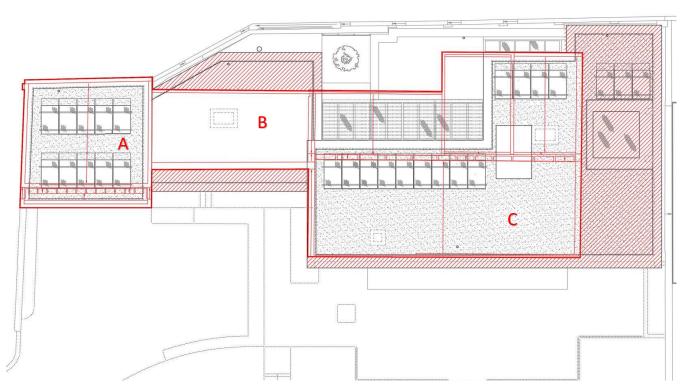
Roof plan: existing plan in red, proposed new areas in red hatch
